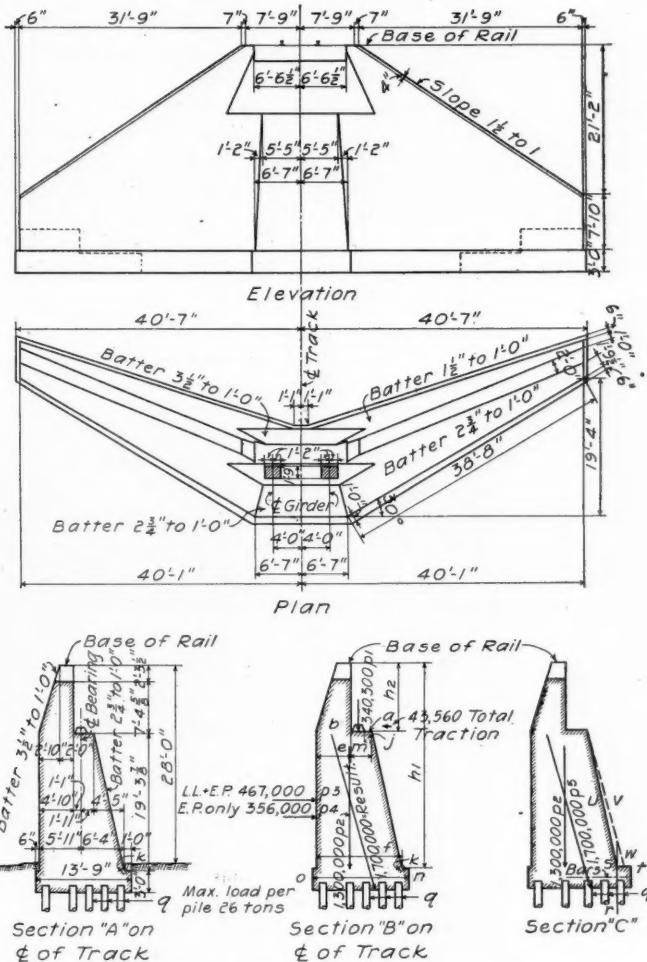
Type B₁; Plain Concrete Wing Abutment, with Plain Concrete Backwall.
